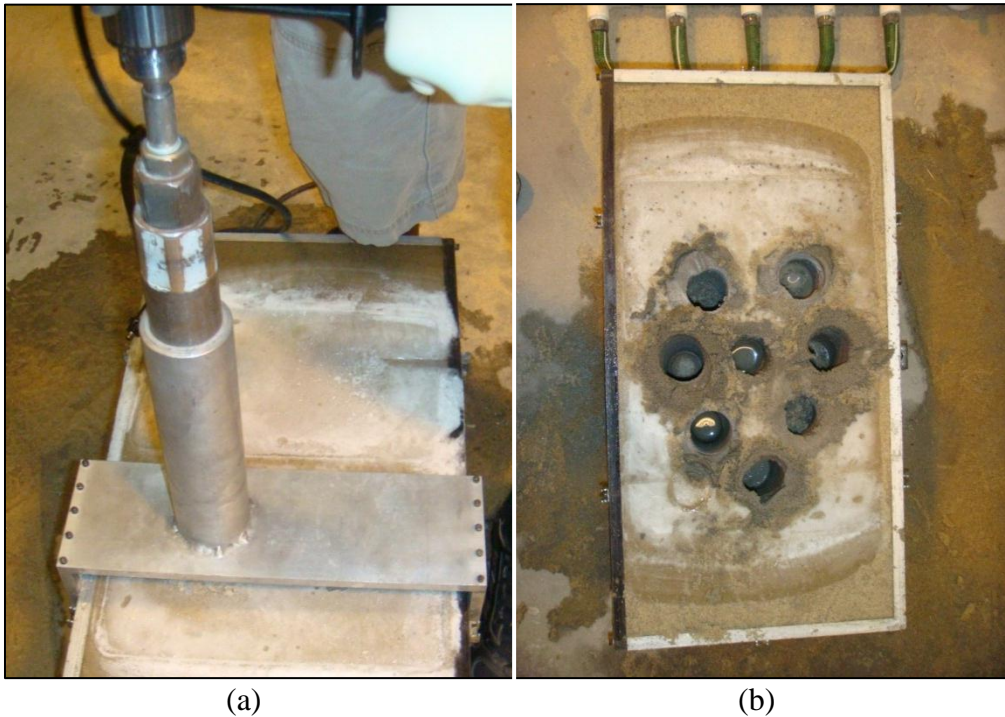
(a) Drilling of Frozen Sand Core Samples with a Hand Drill and Guide Jig. (b) Top View of the Frozen Soil Mass after Specimen Extraction.
